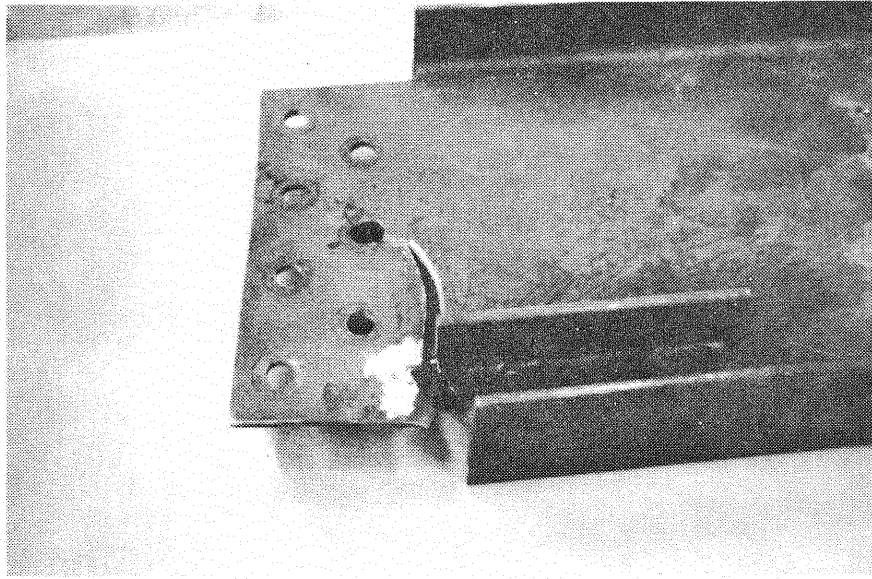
Failure of the Auxiliary Flange Detail
